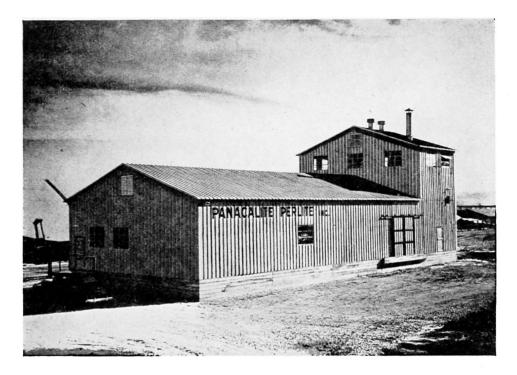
Utility buildings. Light-gauge steel roofs and walls on structural steel rigid frames. Mass-produced for widths from 16 to 100 ft. (Butler Manuf. Co.)
